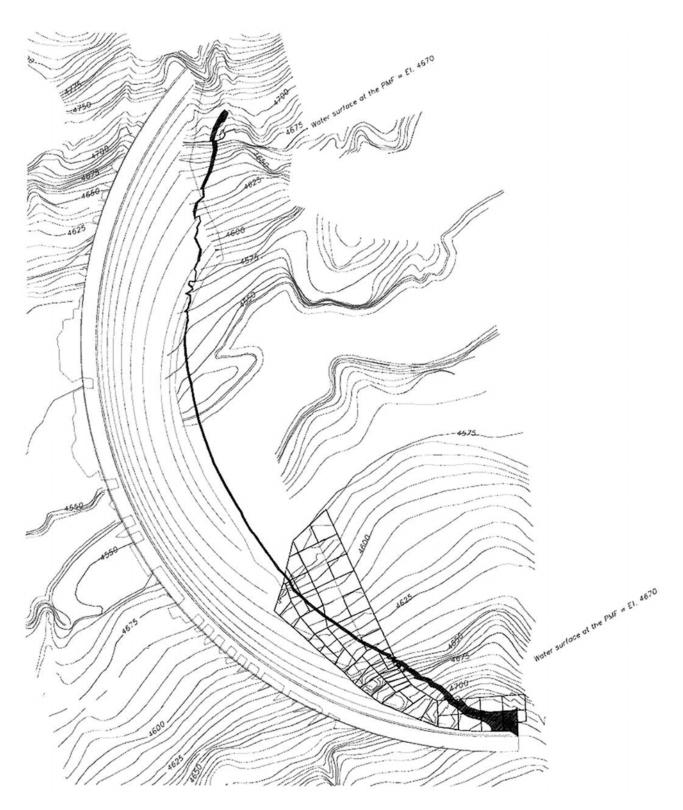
Footprint of the trajectory with no spread of the jet for the PMF overtopping. Note the location of the footprint extends beyond the right abutment protection between contour elevations 4660 and 4710. The tailwater for the PMF is shown on the plan view in blue at Elevation 4670 (Reclamation 2006).
